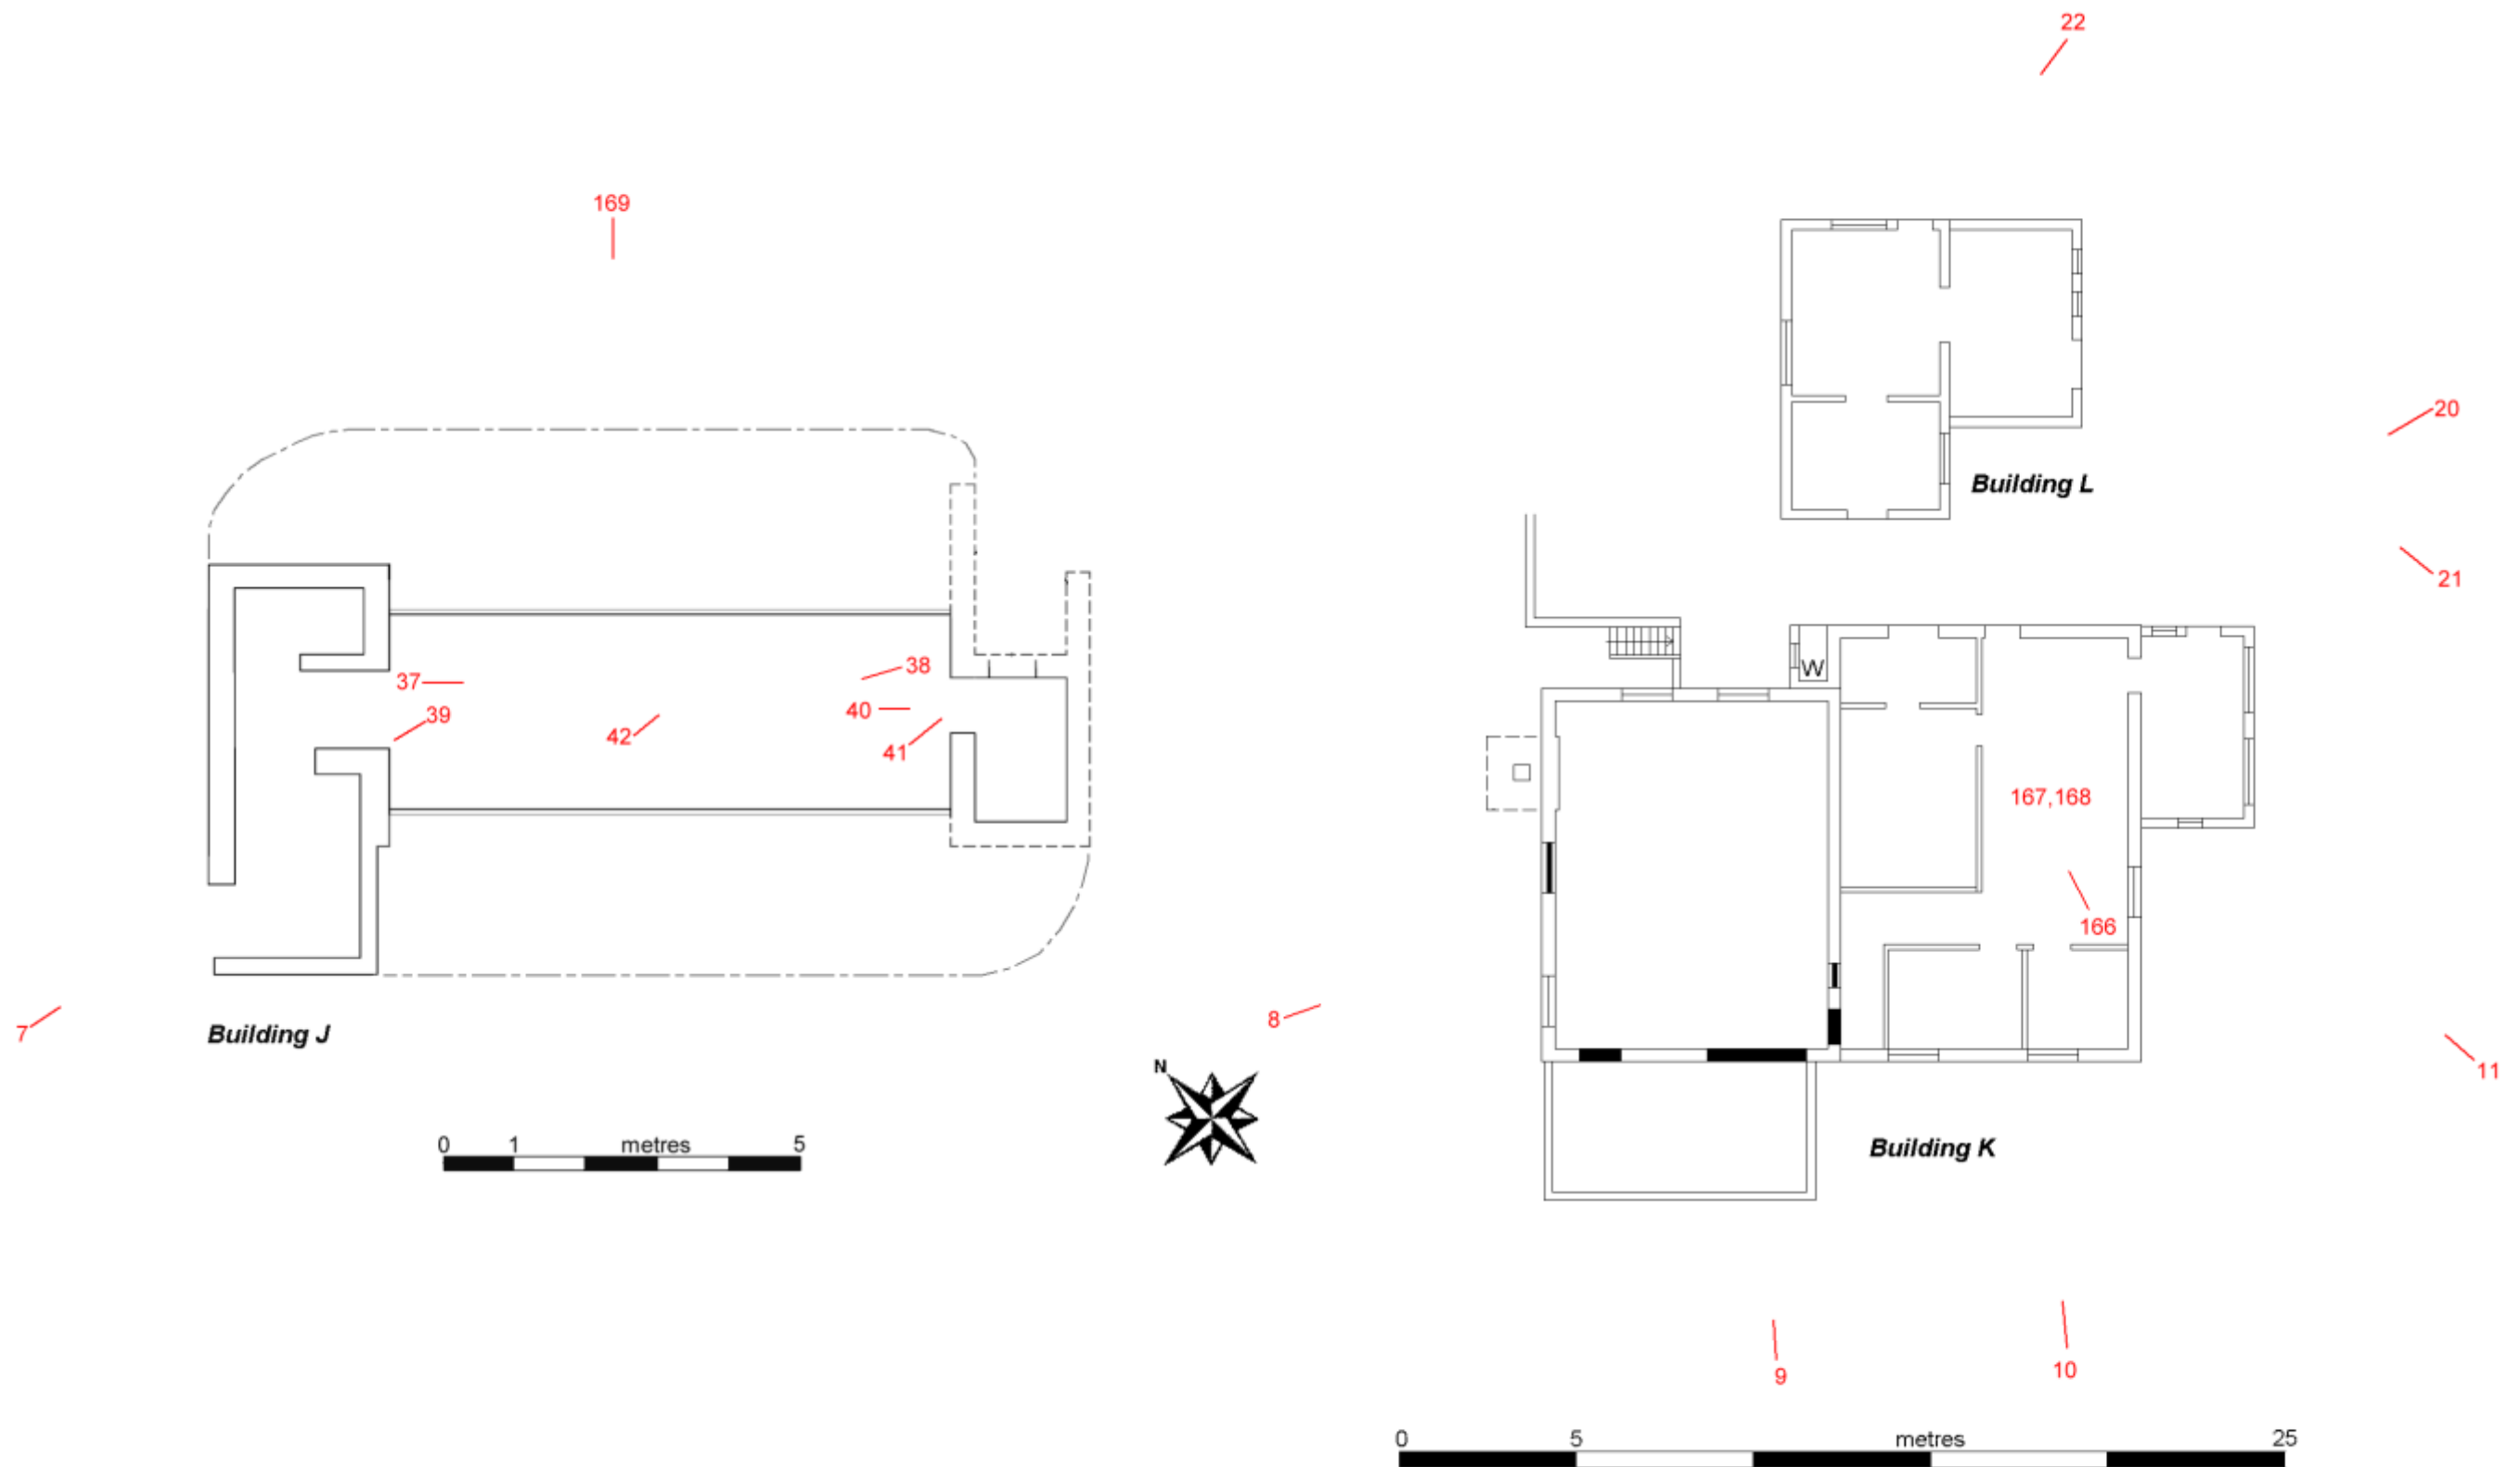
Buildings J, K & L, photo location plans (scales as shown)
